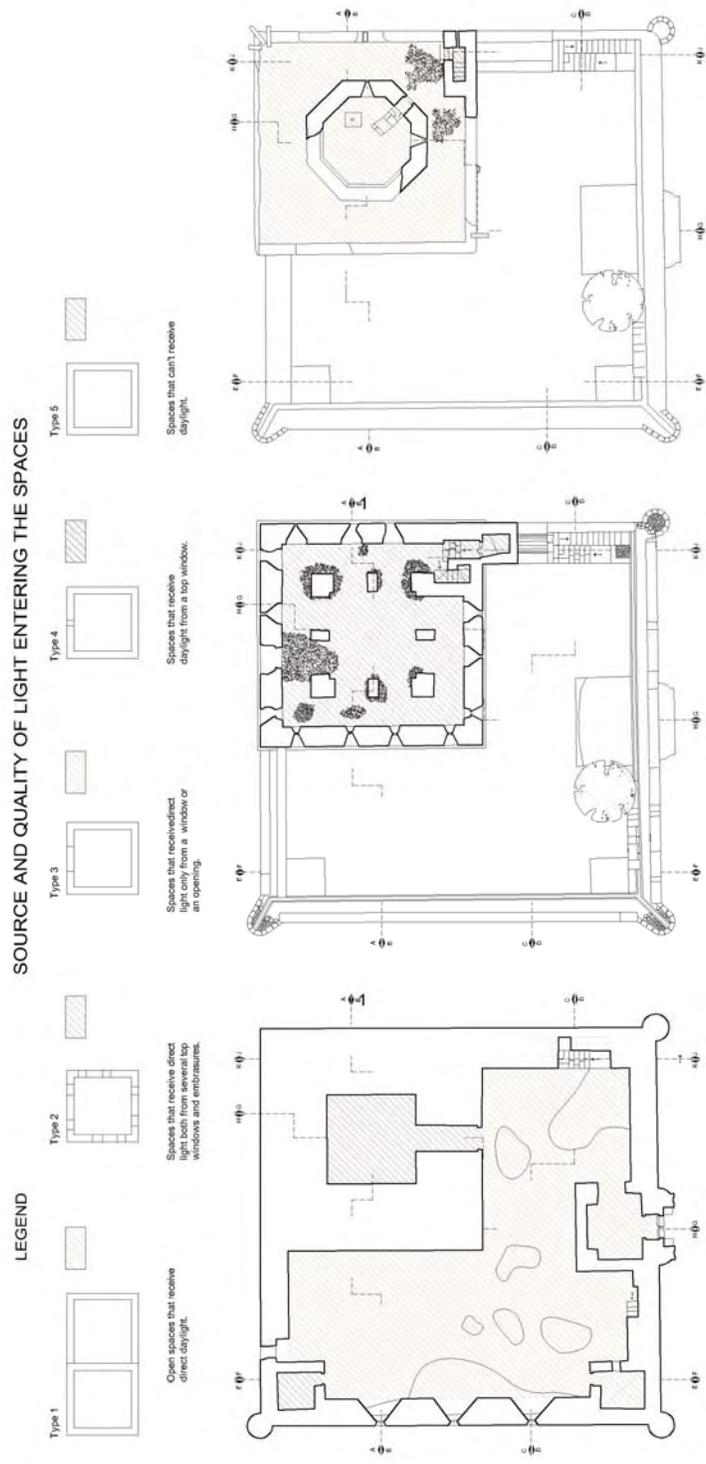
Source and Quality of Light Entering the Spaces- Floor Plans.
